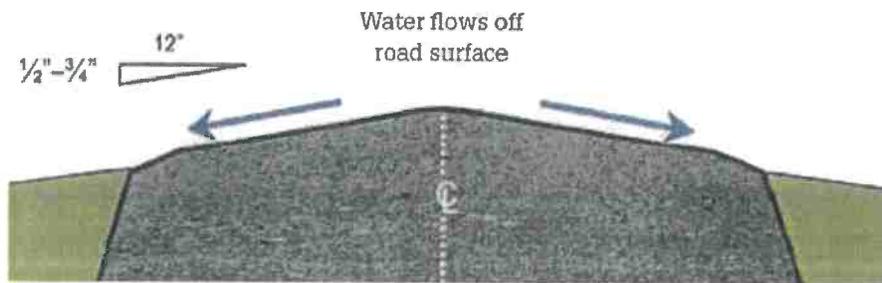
A. Centerline crown with proper cross-slope for an unpaved road. Road drainage flows without obstruction off the road surface into surrounding vegetation. Note the slight grade increase at the road shoulder to encourage off-road drainage (Center for Dirt and Gravel Road Studies, 2005).
